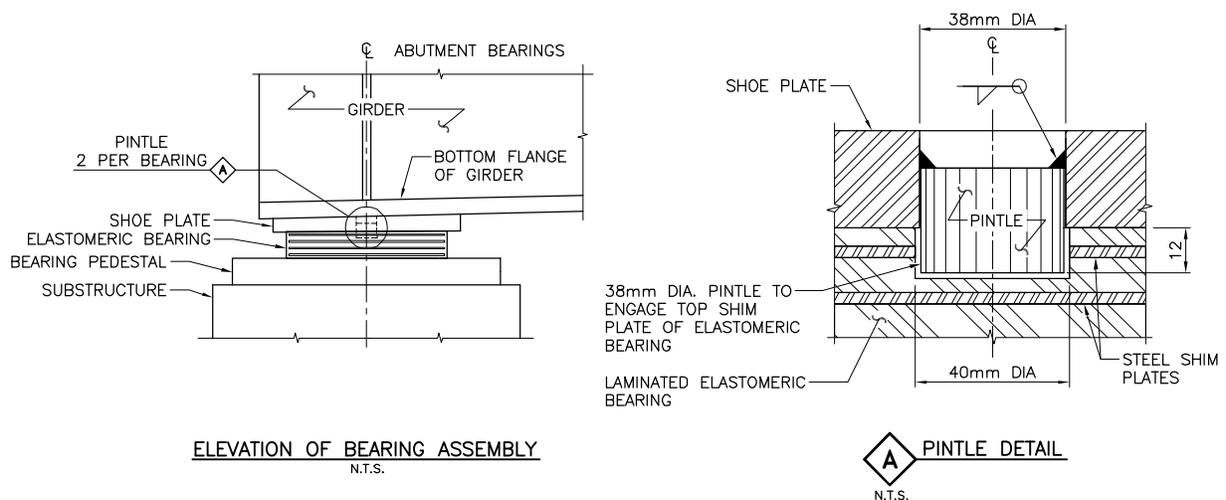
Typical Pintle Detail for Laminated Elastomeric Bearings
